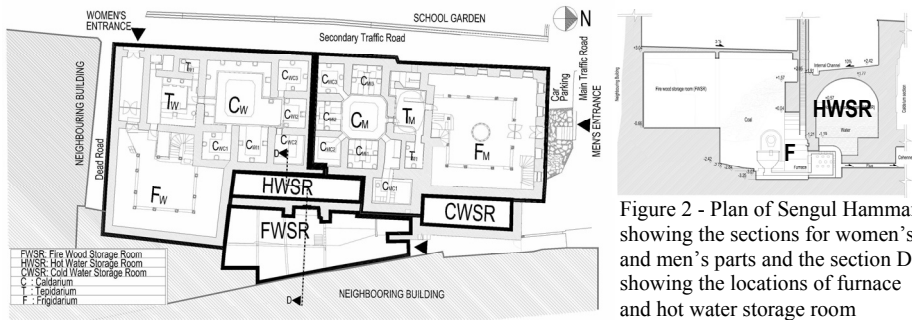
Plan of Sengul Hammam showing the sections for women's and men's parts and the section DD showing the locations of furnace and hot water storage room
